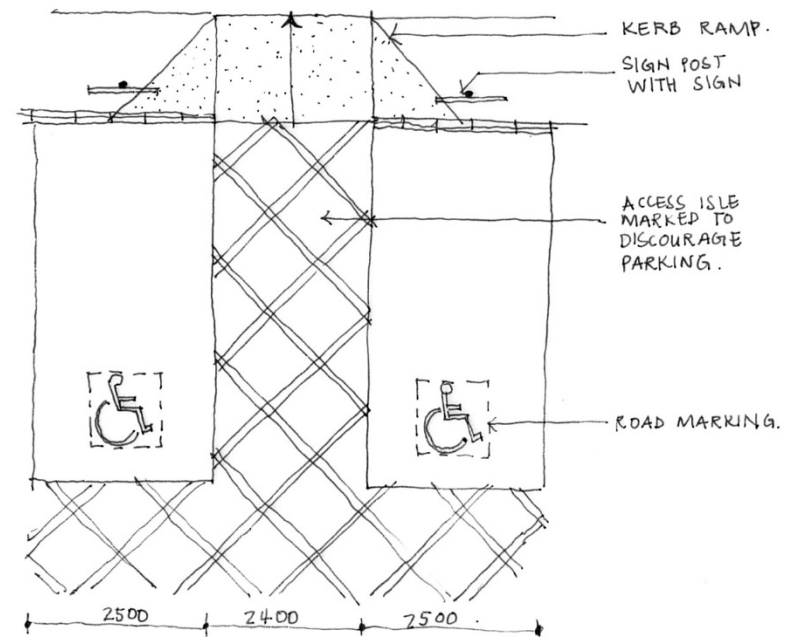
RECOMMENDED PARKING SPACE ALLOCATED
